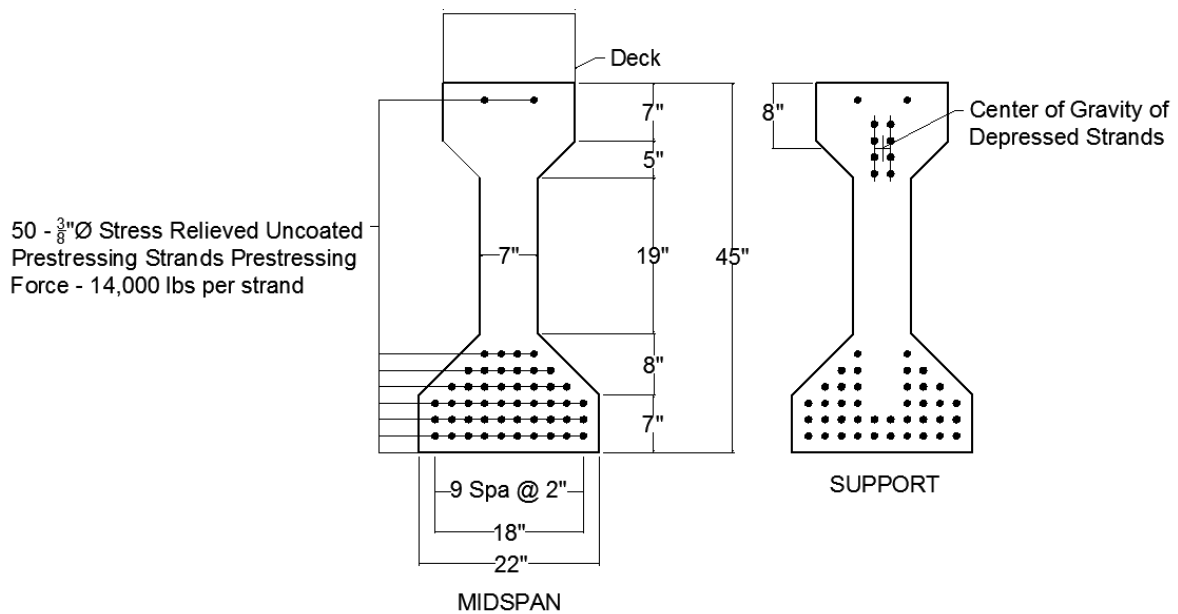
Girder Dimensions and Prestressing Details of AASHTO Type III (1 in. = 2.54 cm)
